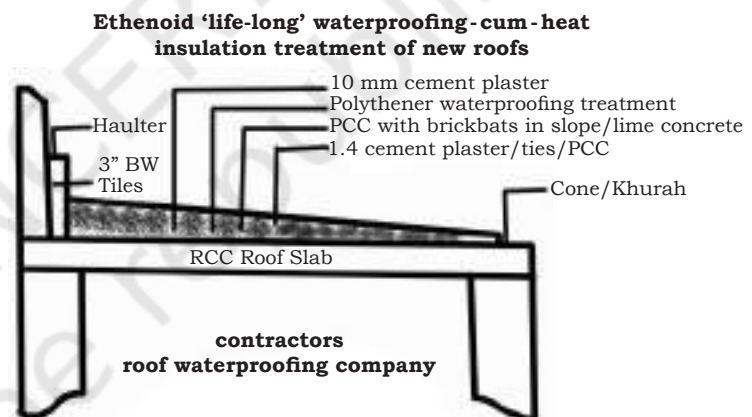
Waterproofing of R.C.C. Roof Slab
